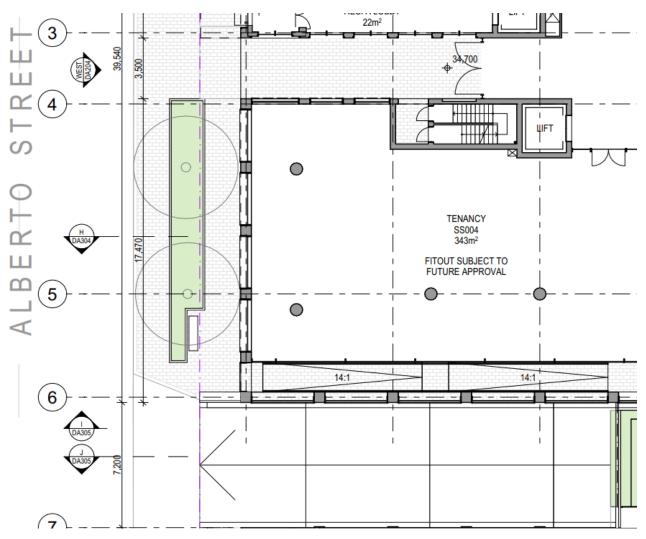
Extract from Ground Floor Plan illustrating vehicle access point from Alberto Street
